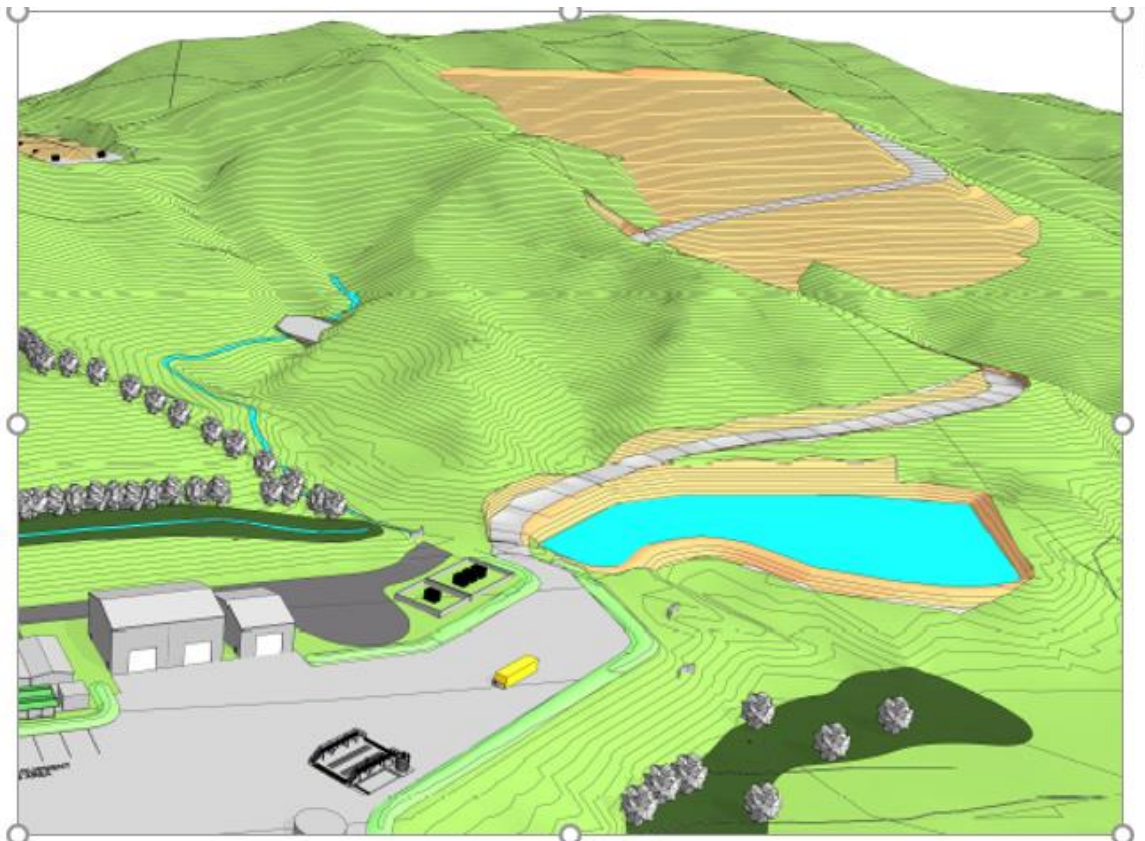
3D View of Willows Road site rock storage and runoff retention ponds (Source: OGNZL)
